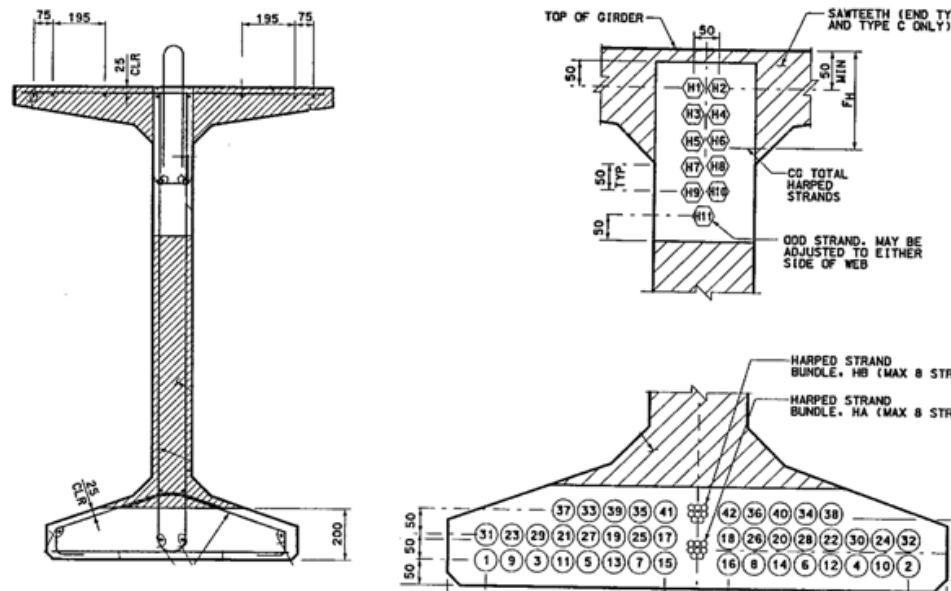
Girder Cross Section and Detail View of Prestressing strand Template (Dimensions in Millimeters)
